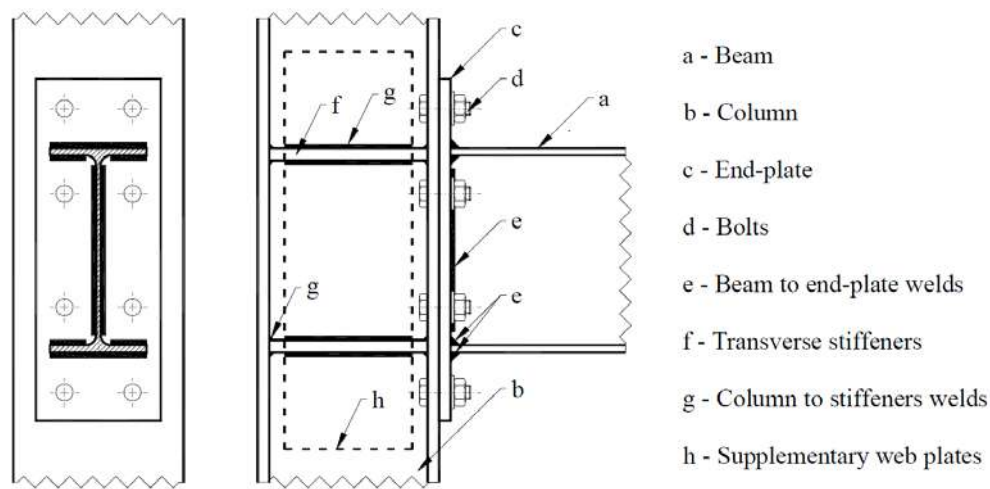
Typical beam-to-column end-plate bolted joint [11]
